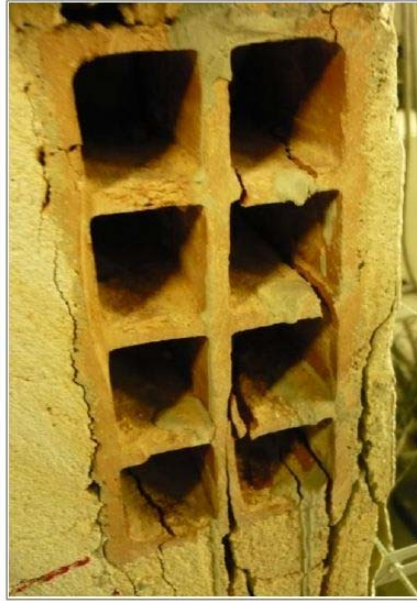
Failure mode of the masonry prisms tested.
